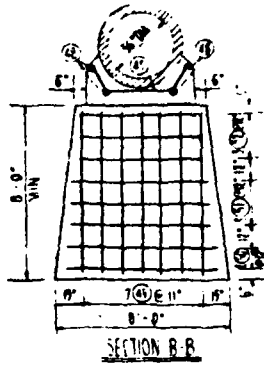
DETAIL OF REINFORCED CONCRETE ANTI-SEEP COLLAR - 6 REQ.
